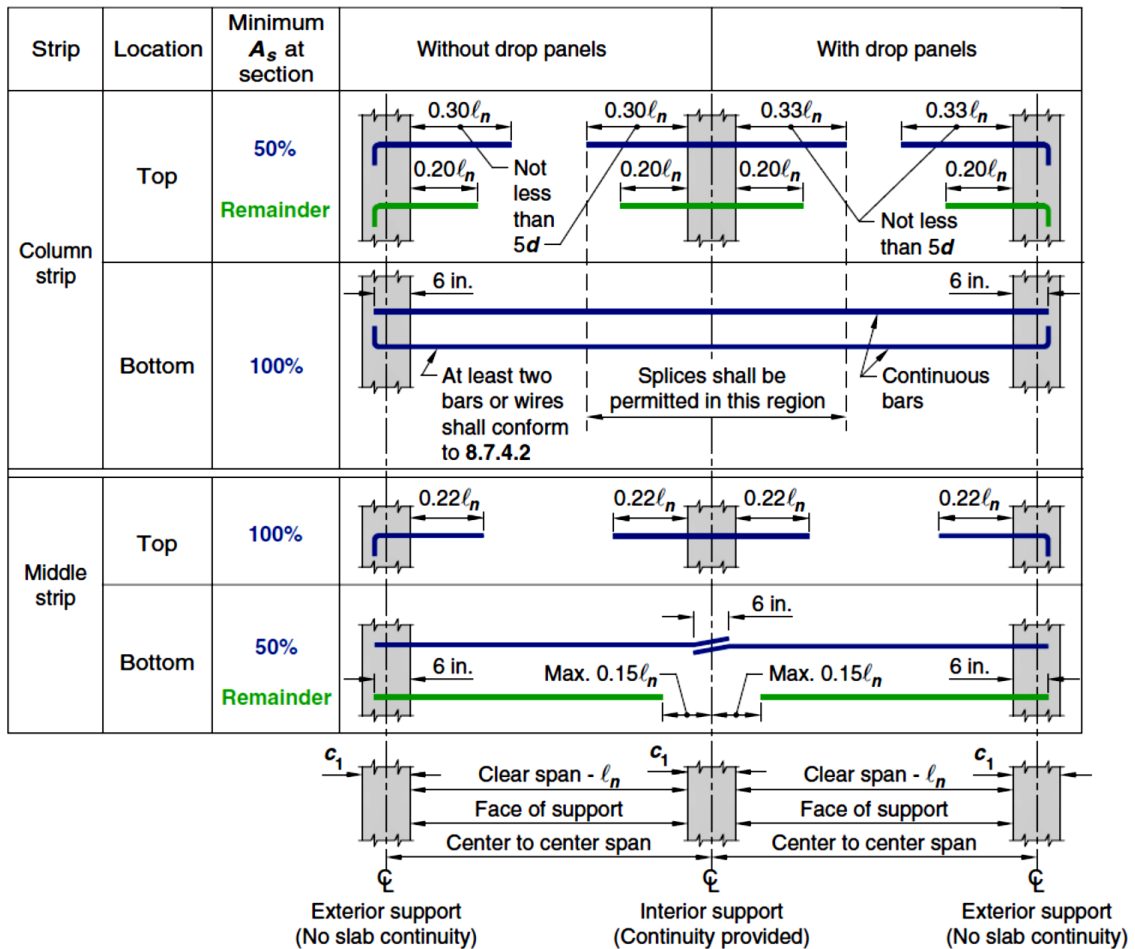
Minimum extensions for deformed reinforcement in two-way slabs without beams.
